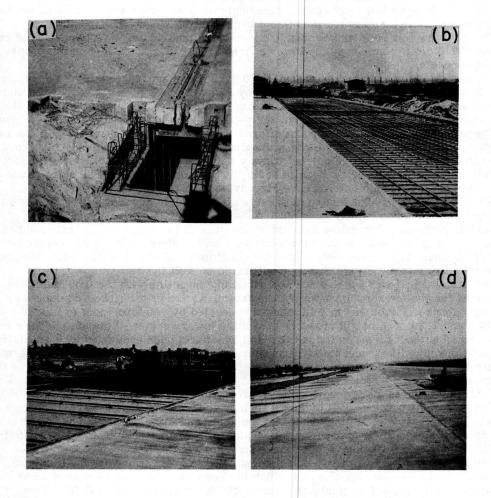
Melsbroek Airport, Belgium: (a) active joint under compression with underpass; (b) construction of a 22-ft wide lane; (c) concreting operations; (d) 2.5-mi long runway without any visible joint (one more lane to pour).
